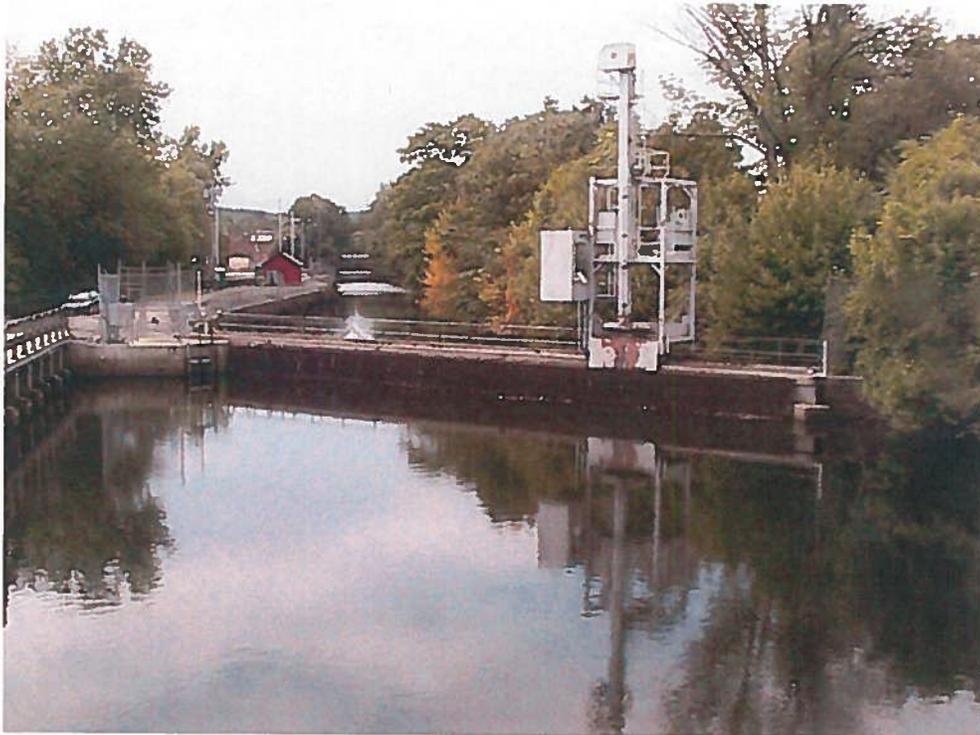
Canal Angled Bar Rack and Downstream Fish Bypass Inlet
